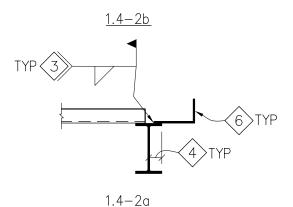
STRUCTURAL STEEL CONSTRUCTION ISSUES - FLOOR
